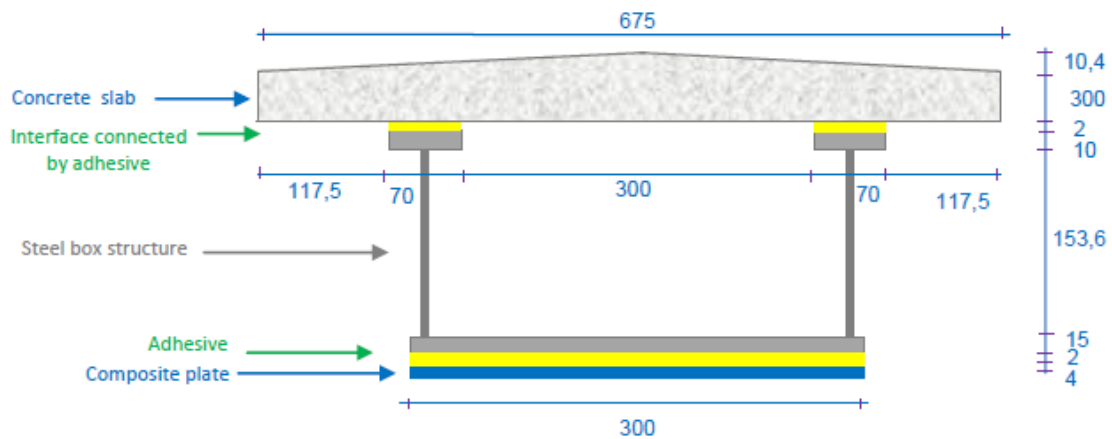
Geometric characteristic of a cross-section of the deck of a composite box girder bridge with perpendicular core 90
